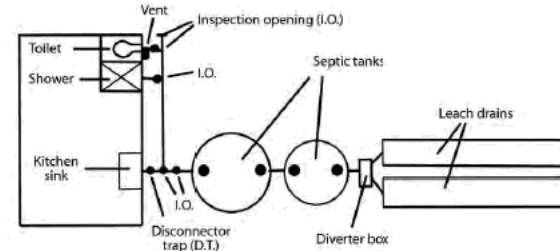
Plan view (top) of an on-site sewage disposal system.
